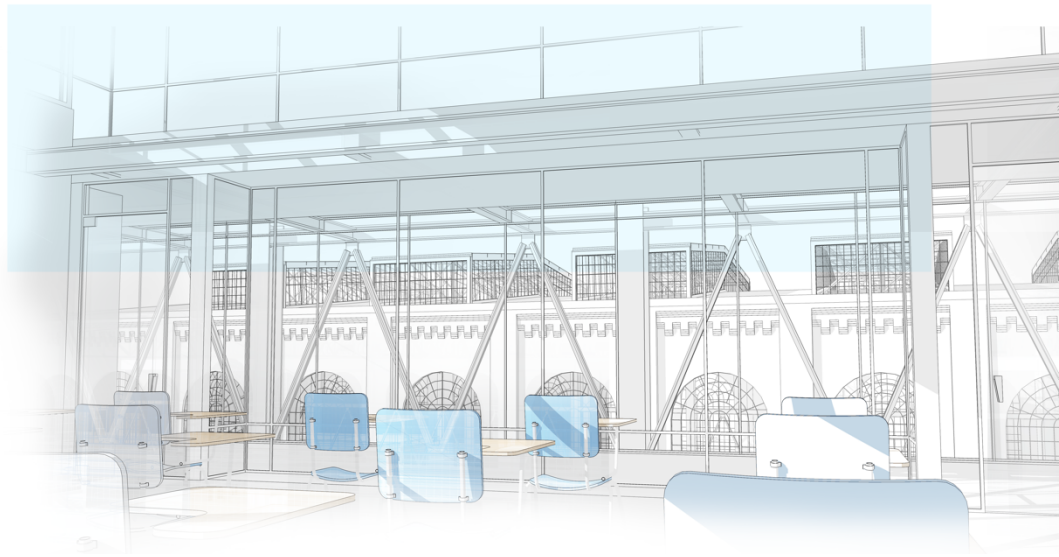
, Science Lab Classroom, Seated, Looking towards Tractor Building (Source: Author)
